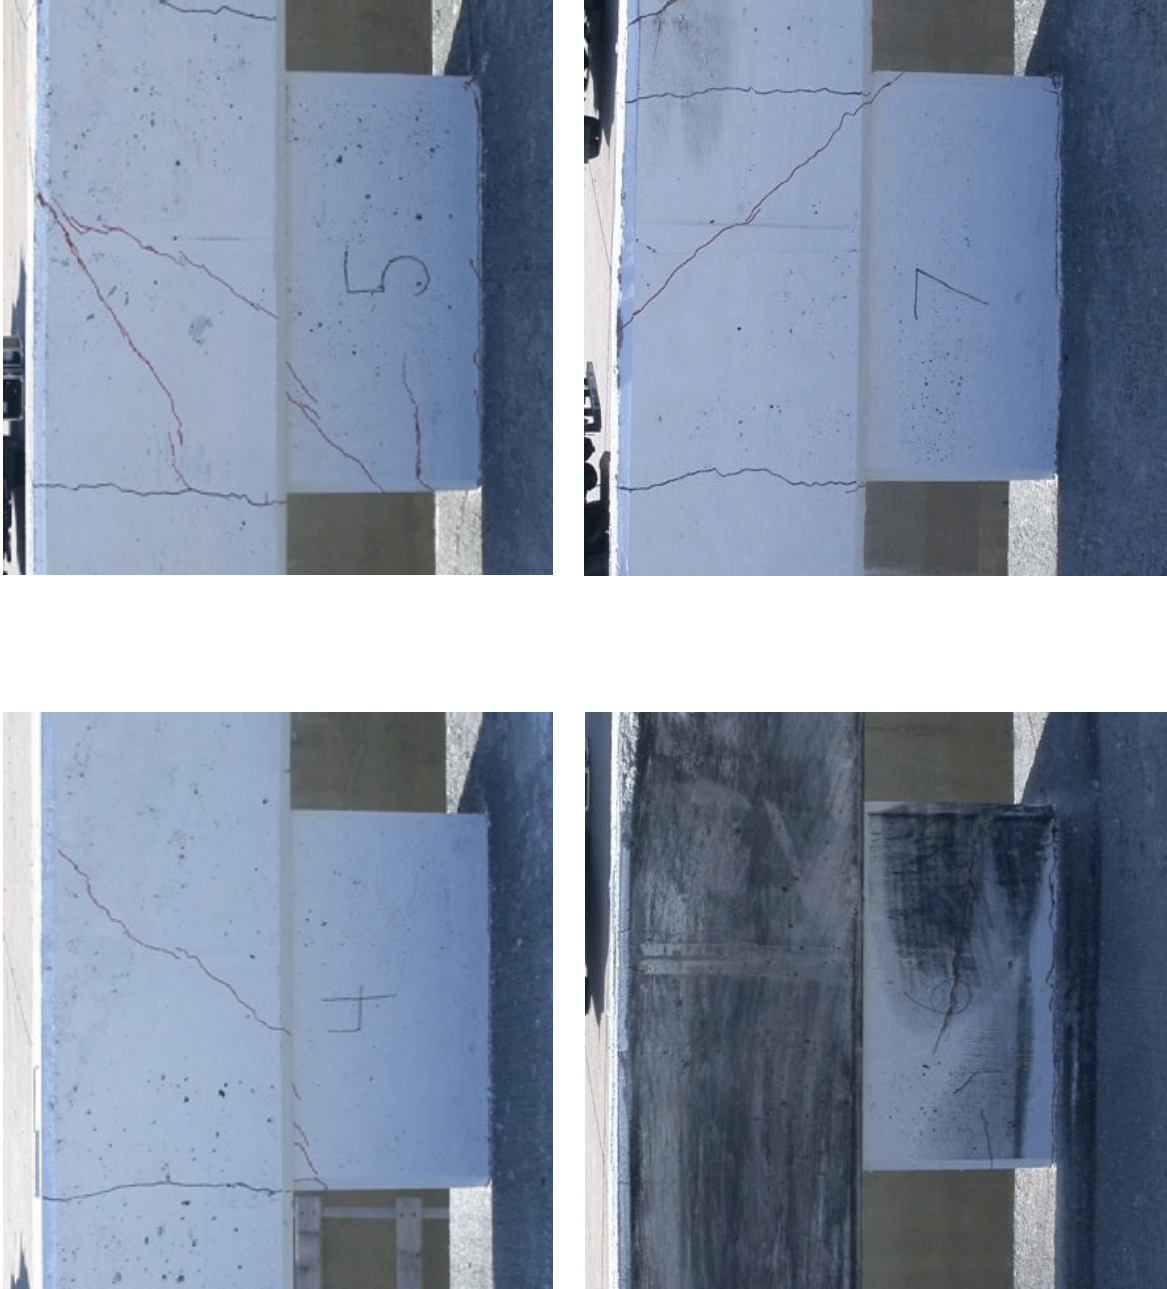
Open Concrete Bridge Rail Post Damage, Test NIT-1
